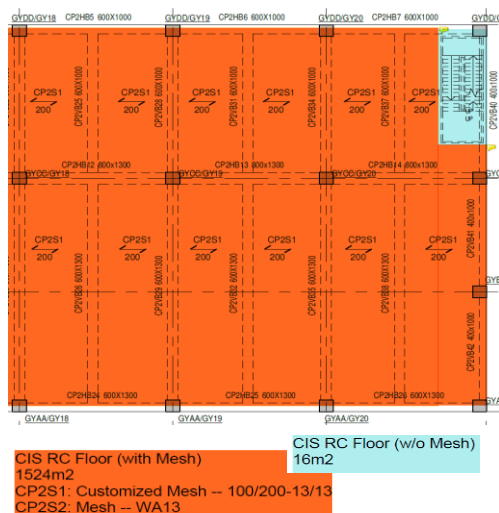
Plan demarcating floor areas with welded mesh adoption, and the size of floor mesh
